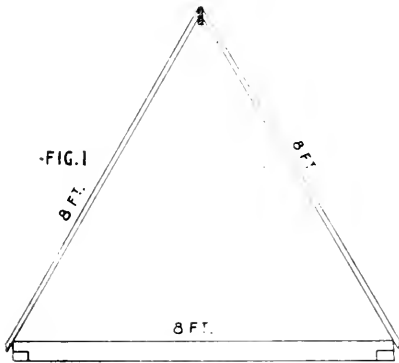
Showing sills made of 4x4 inch scantling, and slope of roof. Two 4x4 inch scantling, 16 feet long, make the sills.
